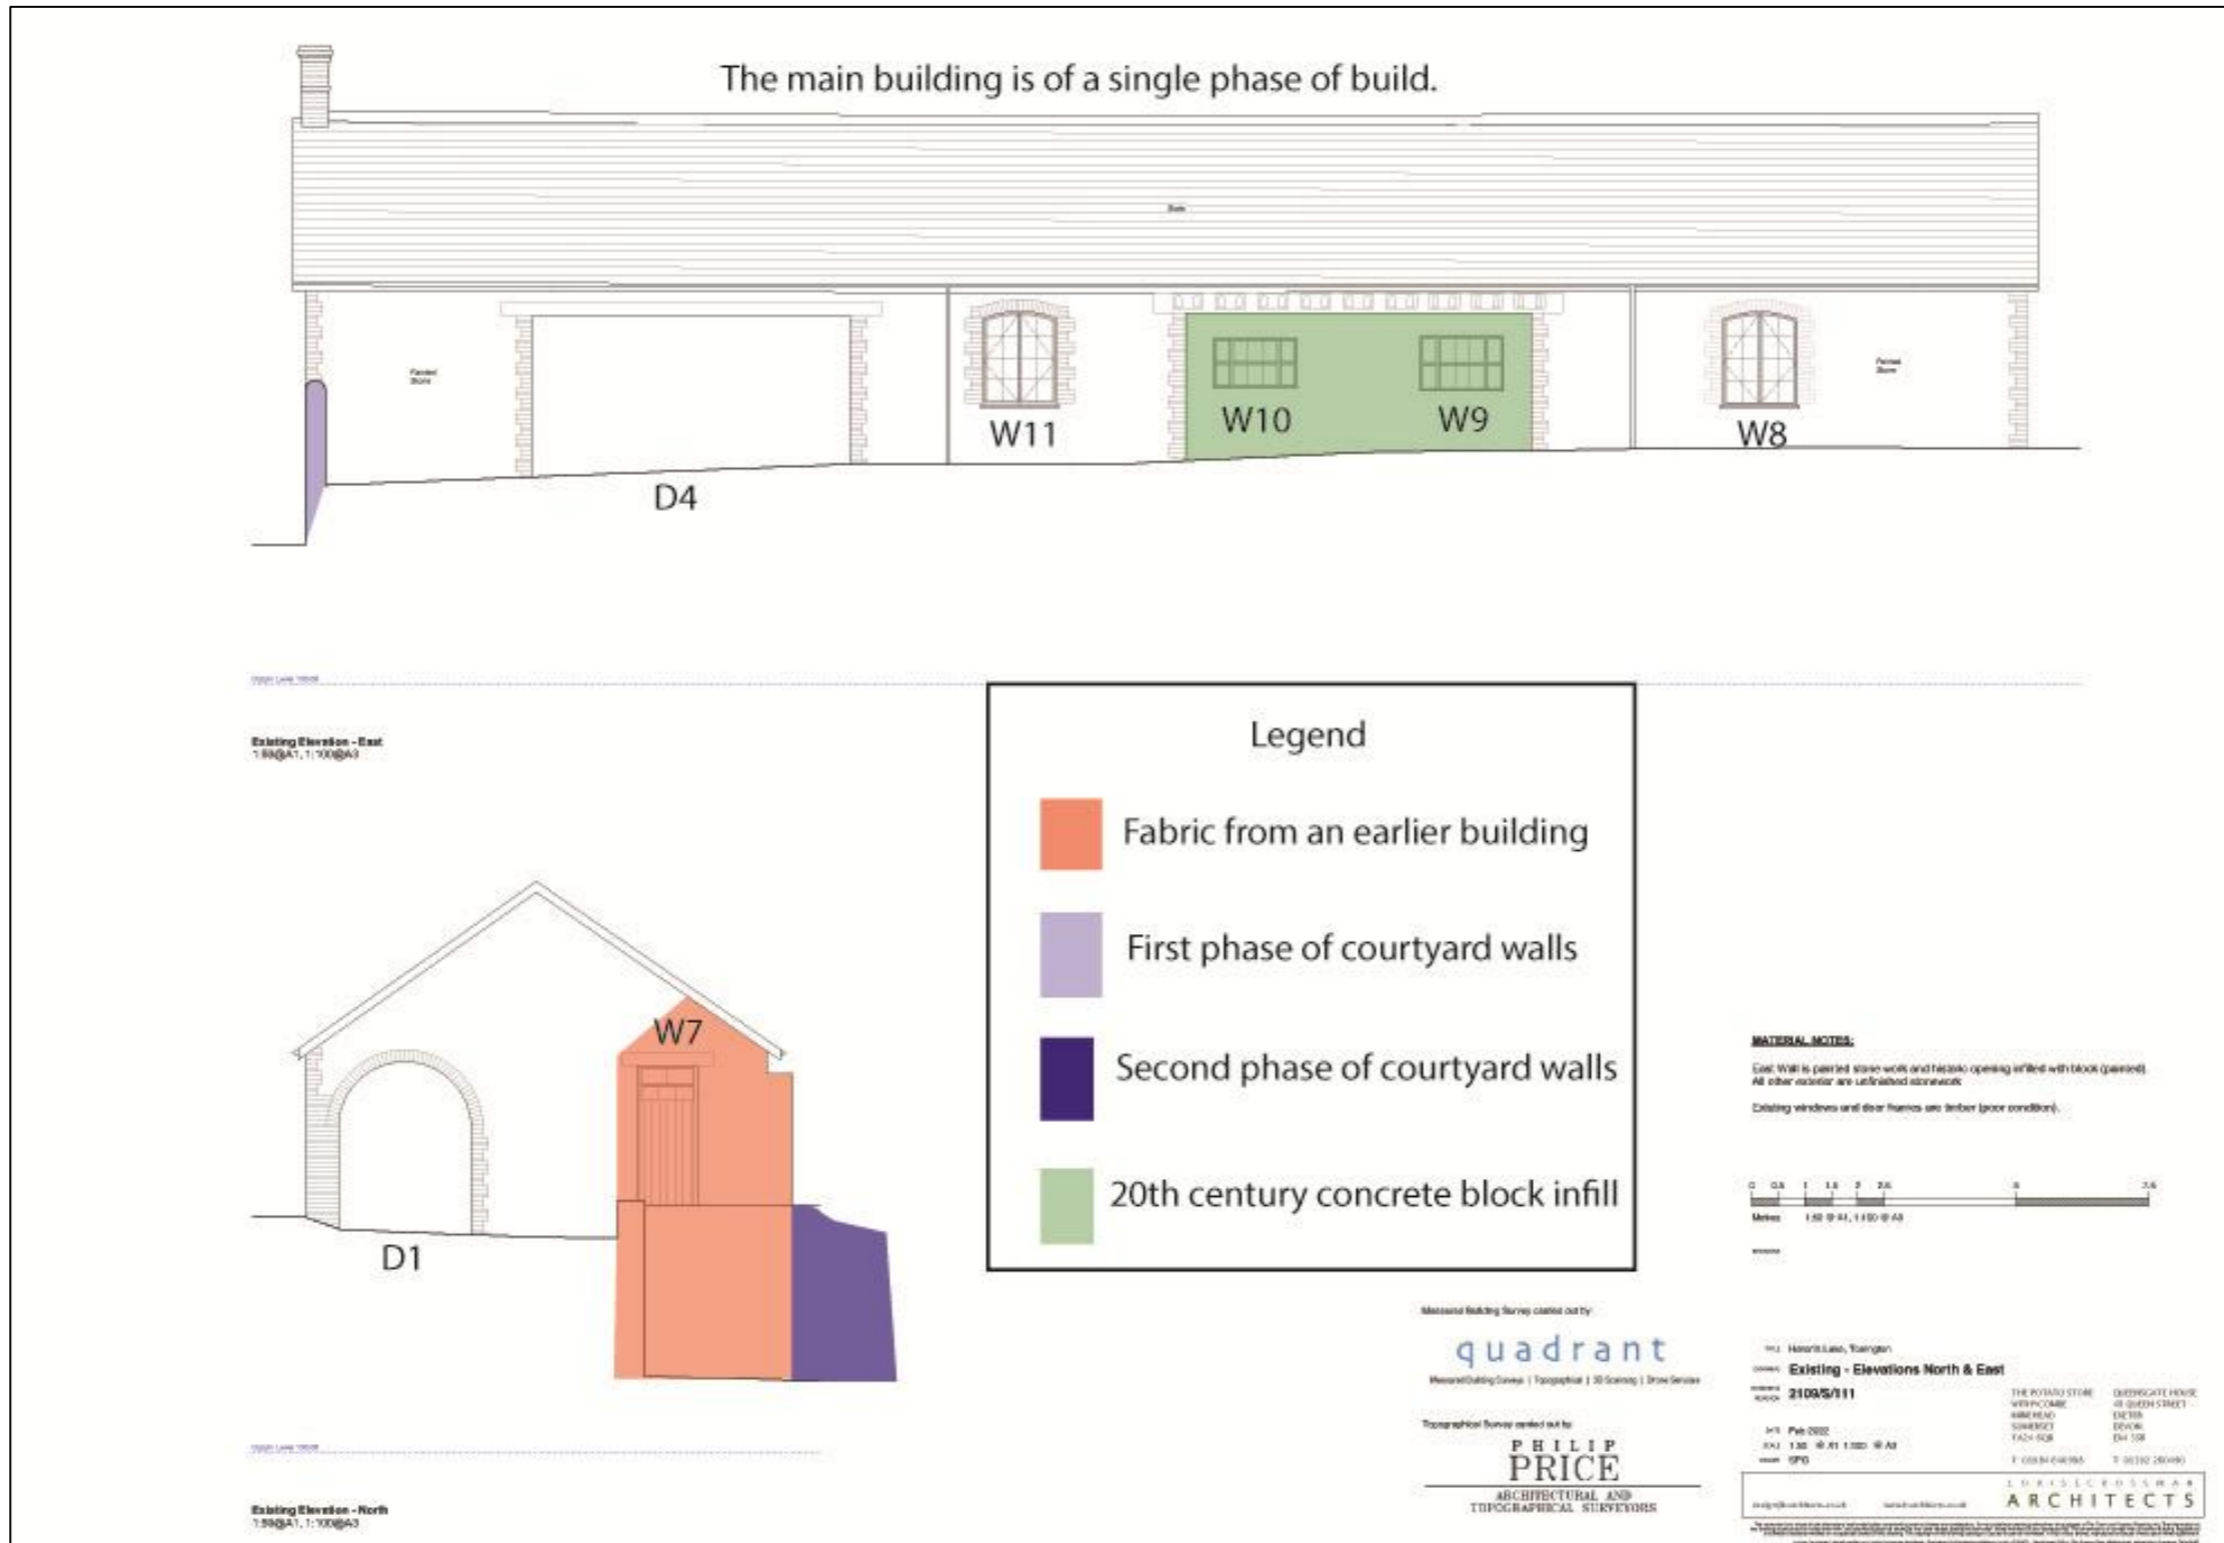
PHASED PLAN OF ELEVATIONS; EAST AND NORTH.
